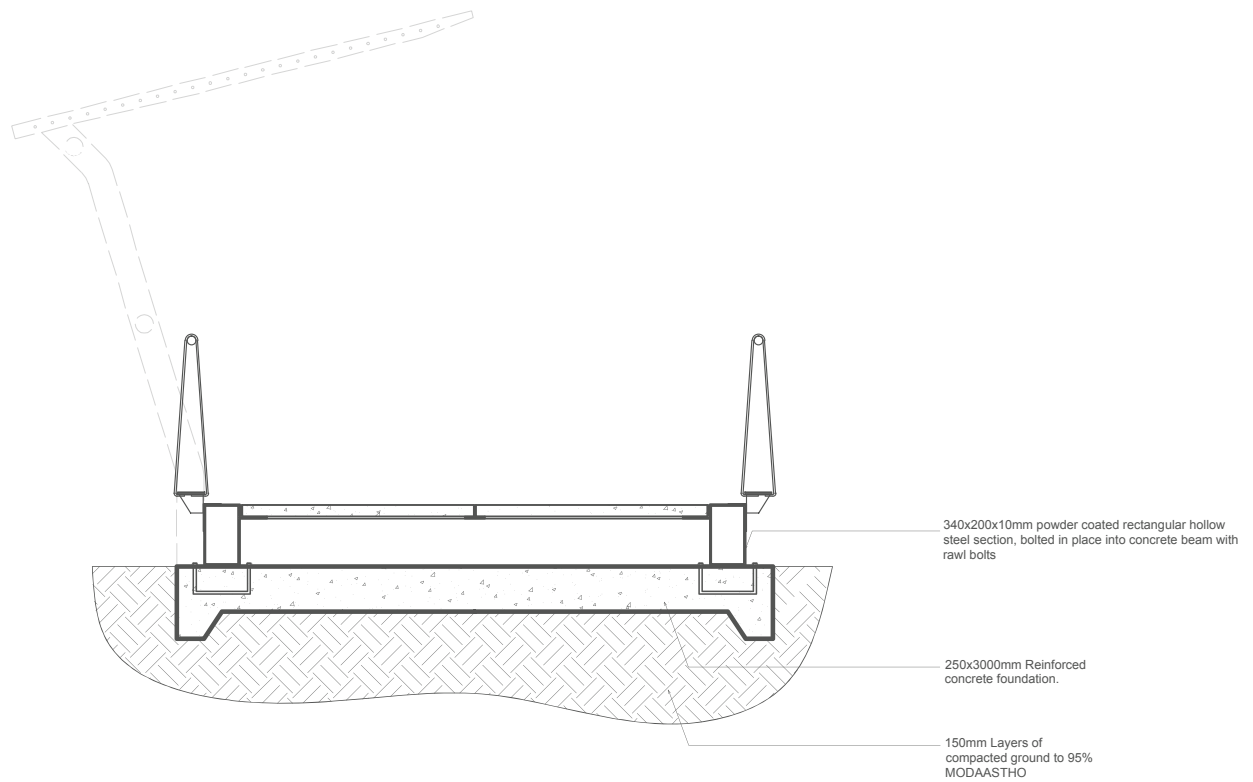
Section through pedestrian bridge over retention dam - foundation
